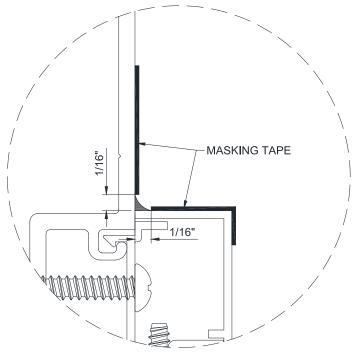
Sealing Two-Piece Door Stop and Door Jamb
